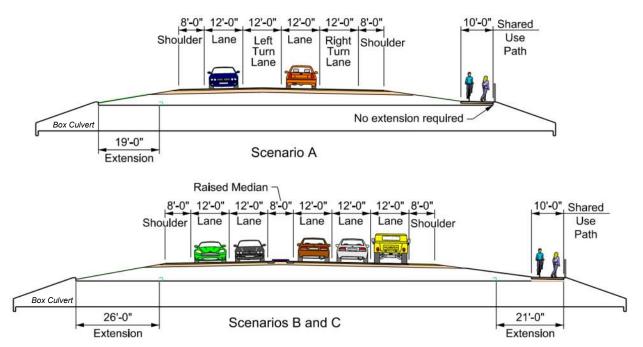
US14 Bypass/Western Avenue Intersection Box Culvert Typical Sections
